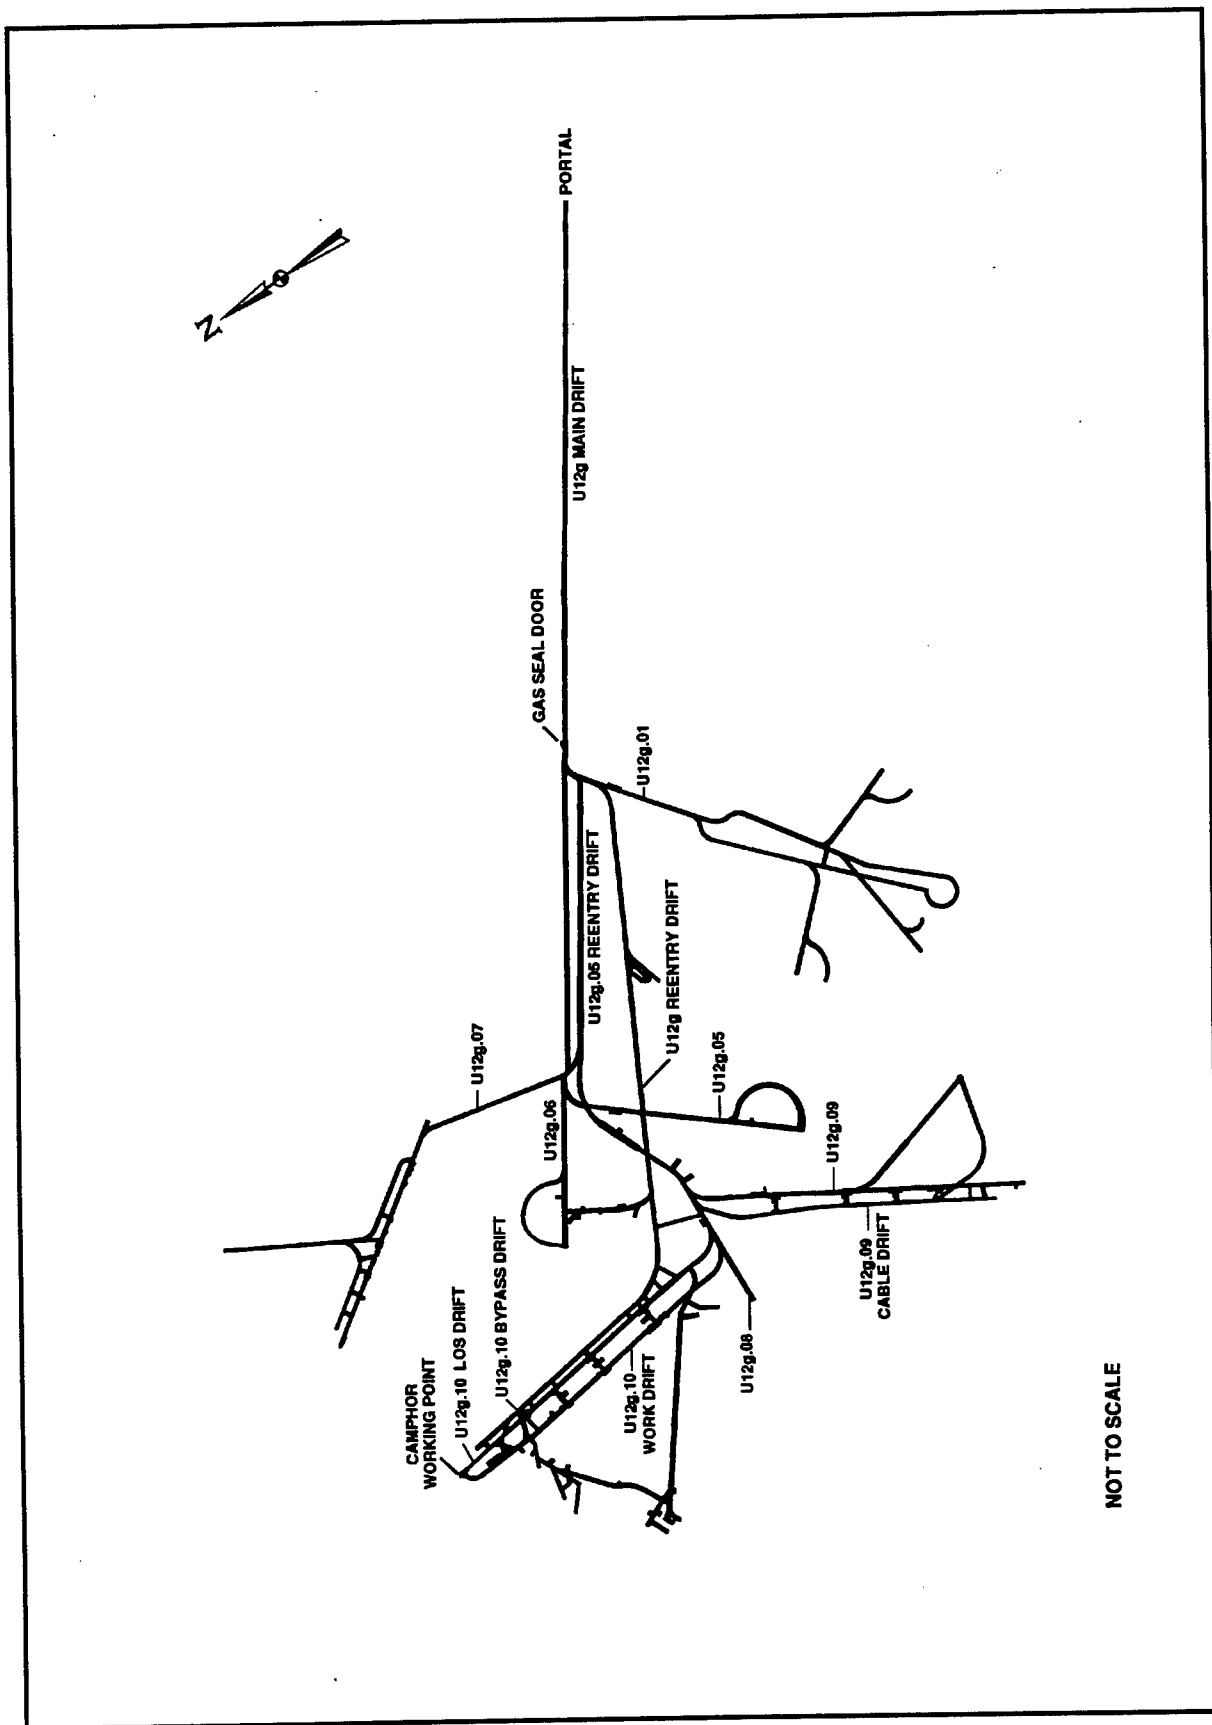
CAMPHOR event - modified postevent tunnel layout.
